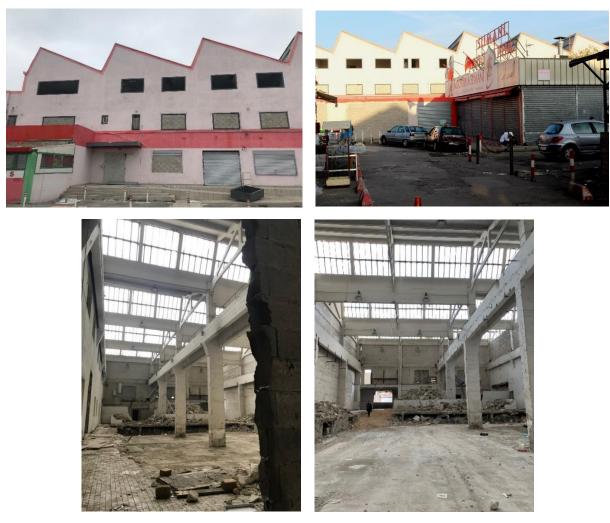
Pictures of the outside and interior structure of the study building (personal source)
